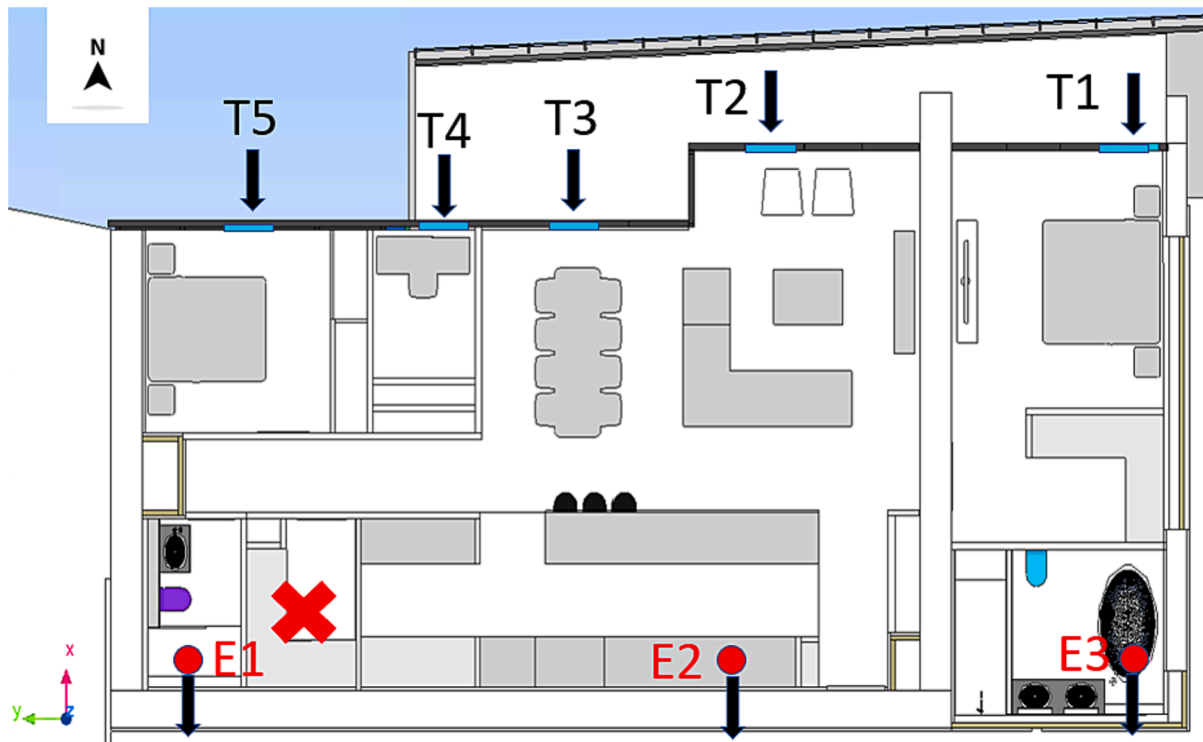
The two-bedroom apartment plan with cross-ventilation features. Three fan extraction grilles: E1-E3 (on the South side) and five trickle ventilators T1-T5 (on the North-facing window frames). The laundry volume (red cross) was removed from CFD simulations. (For interpretation of the references to colour in this figure legend, the reader is referred to the web version of this article.)
